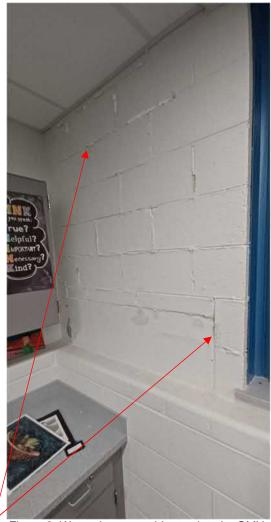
Water damage evident at interior CMU, in classroom @ bottom of brick pier.
